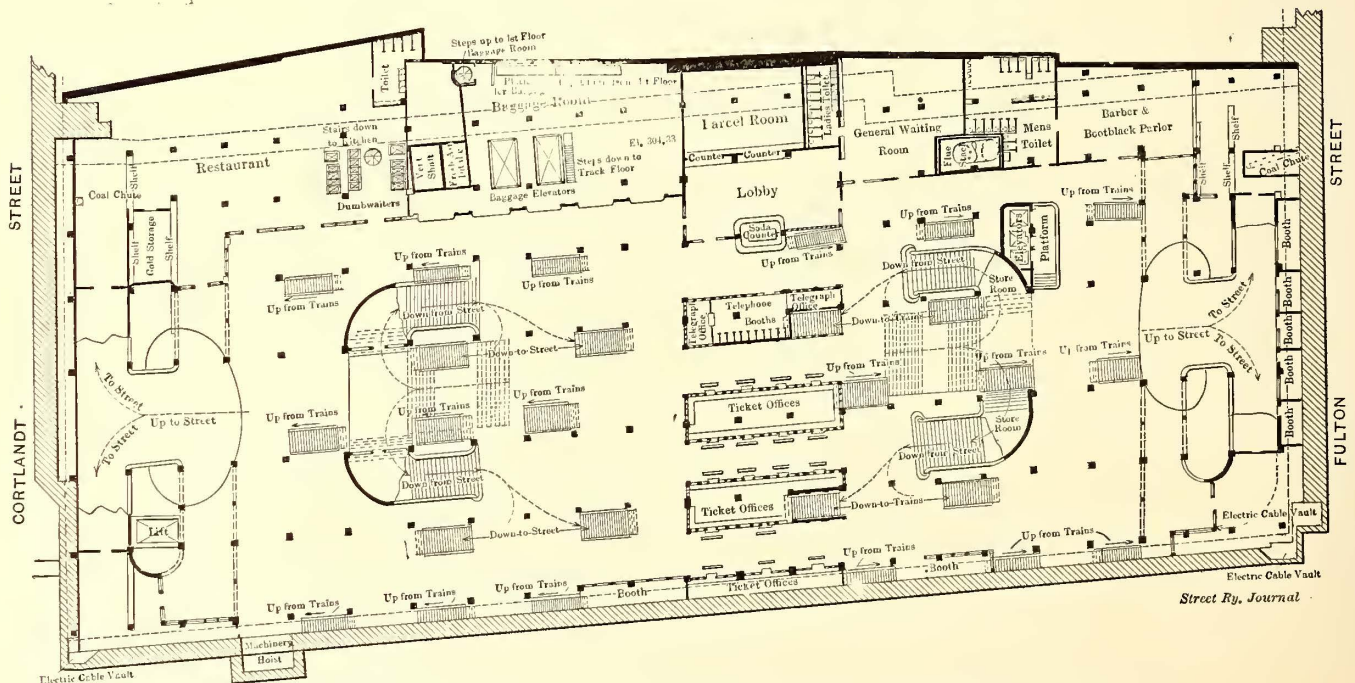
PLAN OF CONCOURSE FLOOR, WITH WAITING ROOM, TICKET OFFICES, ETC.
